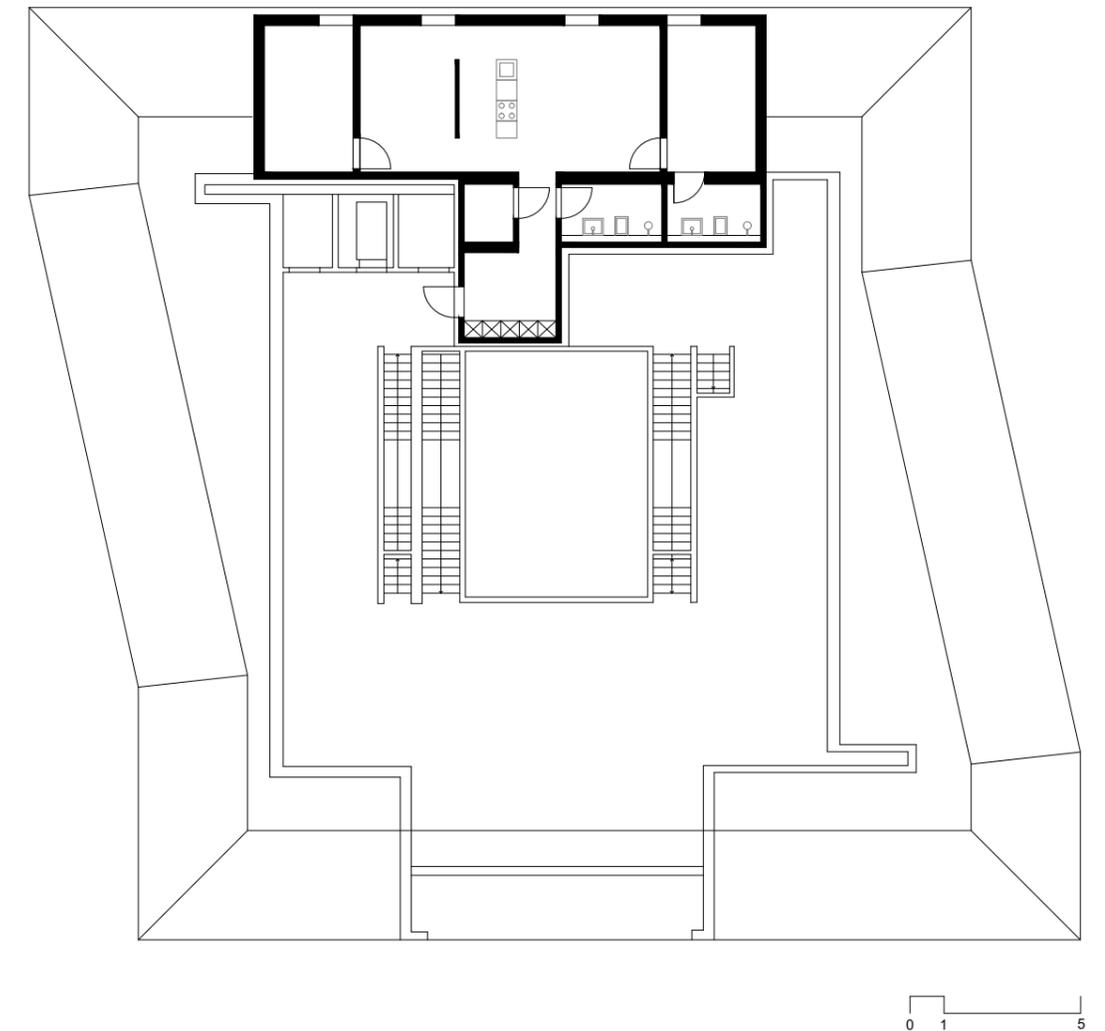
NEST-Unit Urban Mining & Recycling (UMAR), module floor plan
